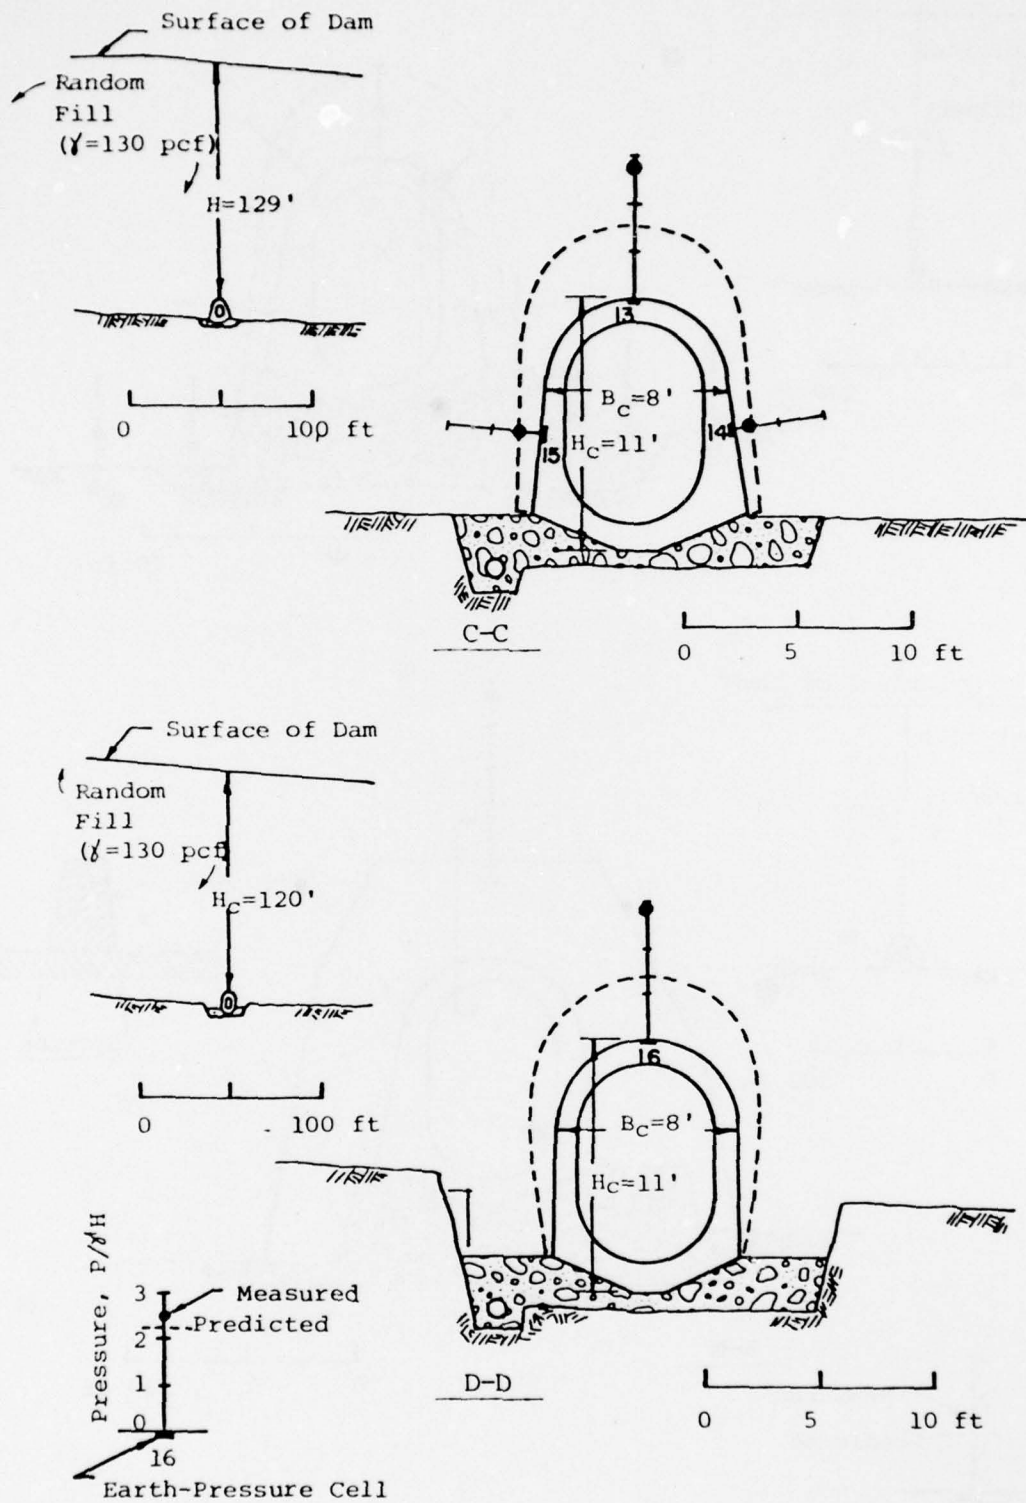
EARTH PRESSURES AT END OF CONSTRUCTION, INSTRUMENT STATIONS C-C AND D-D, DIERKS LAKE DAM
